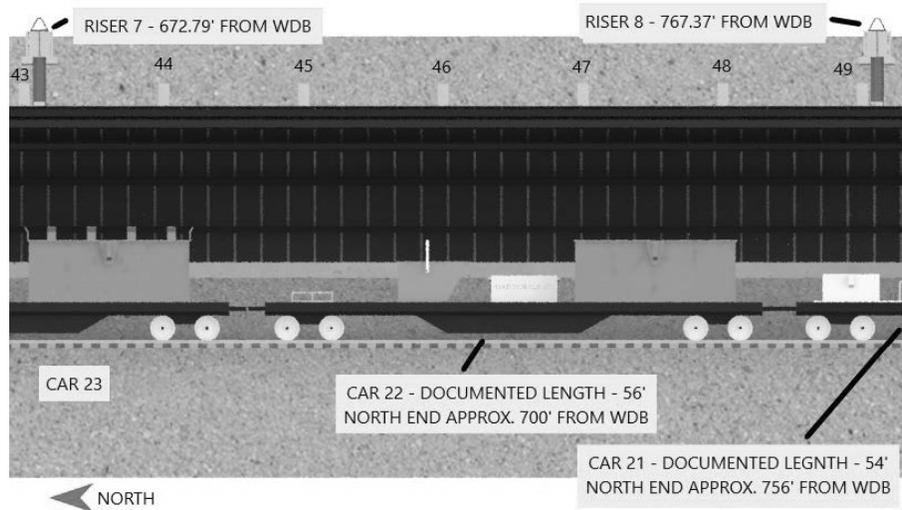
Riser 7 to Riser 8 Tunnel Section.
